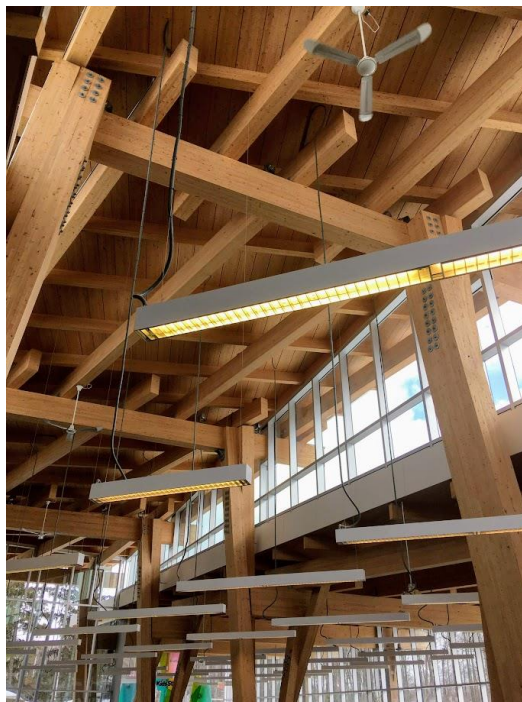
Interior of a contemporary timber building in Scarborough, Ontario (author's photo).
